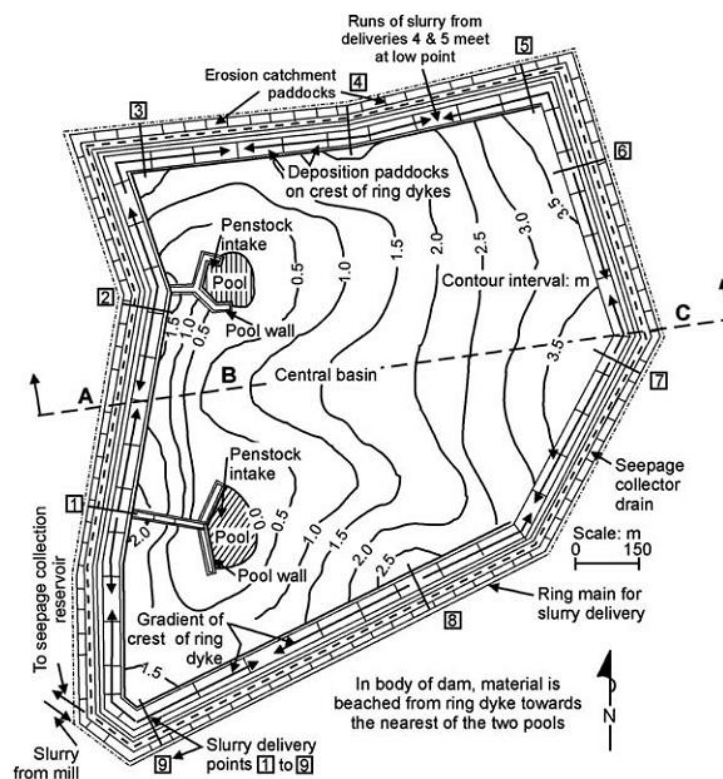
Plan View of Conventional Tailings Storage Facility (Blight 2009)
